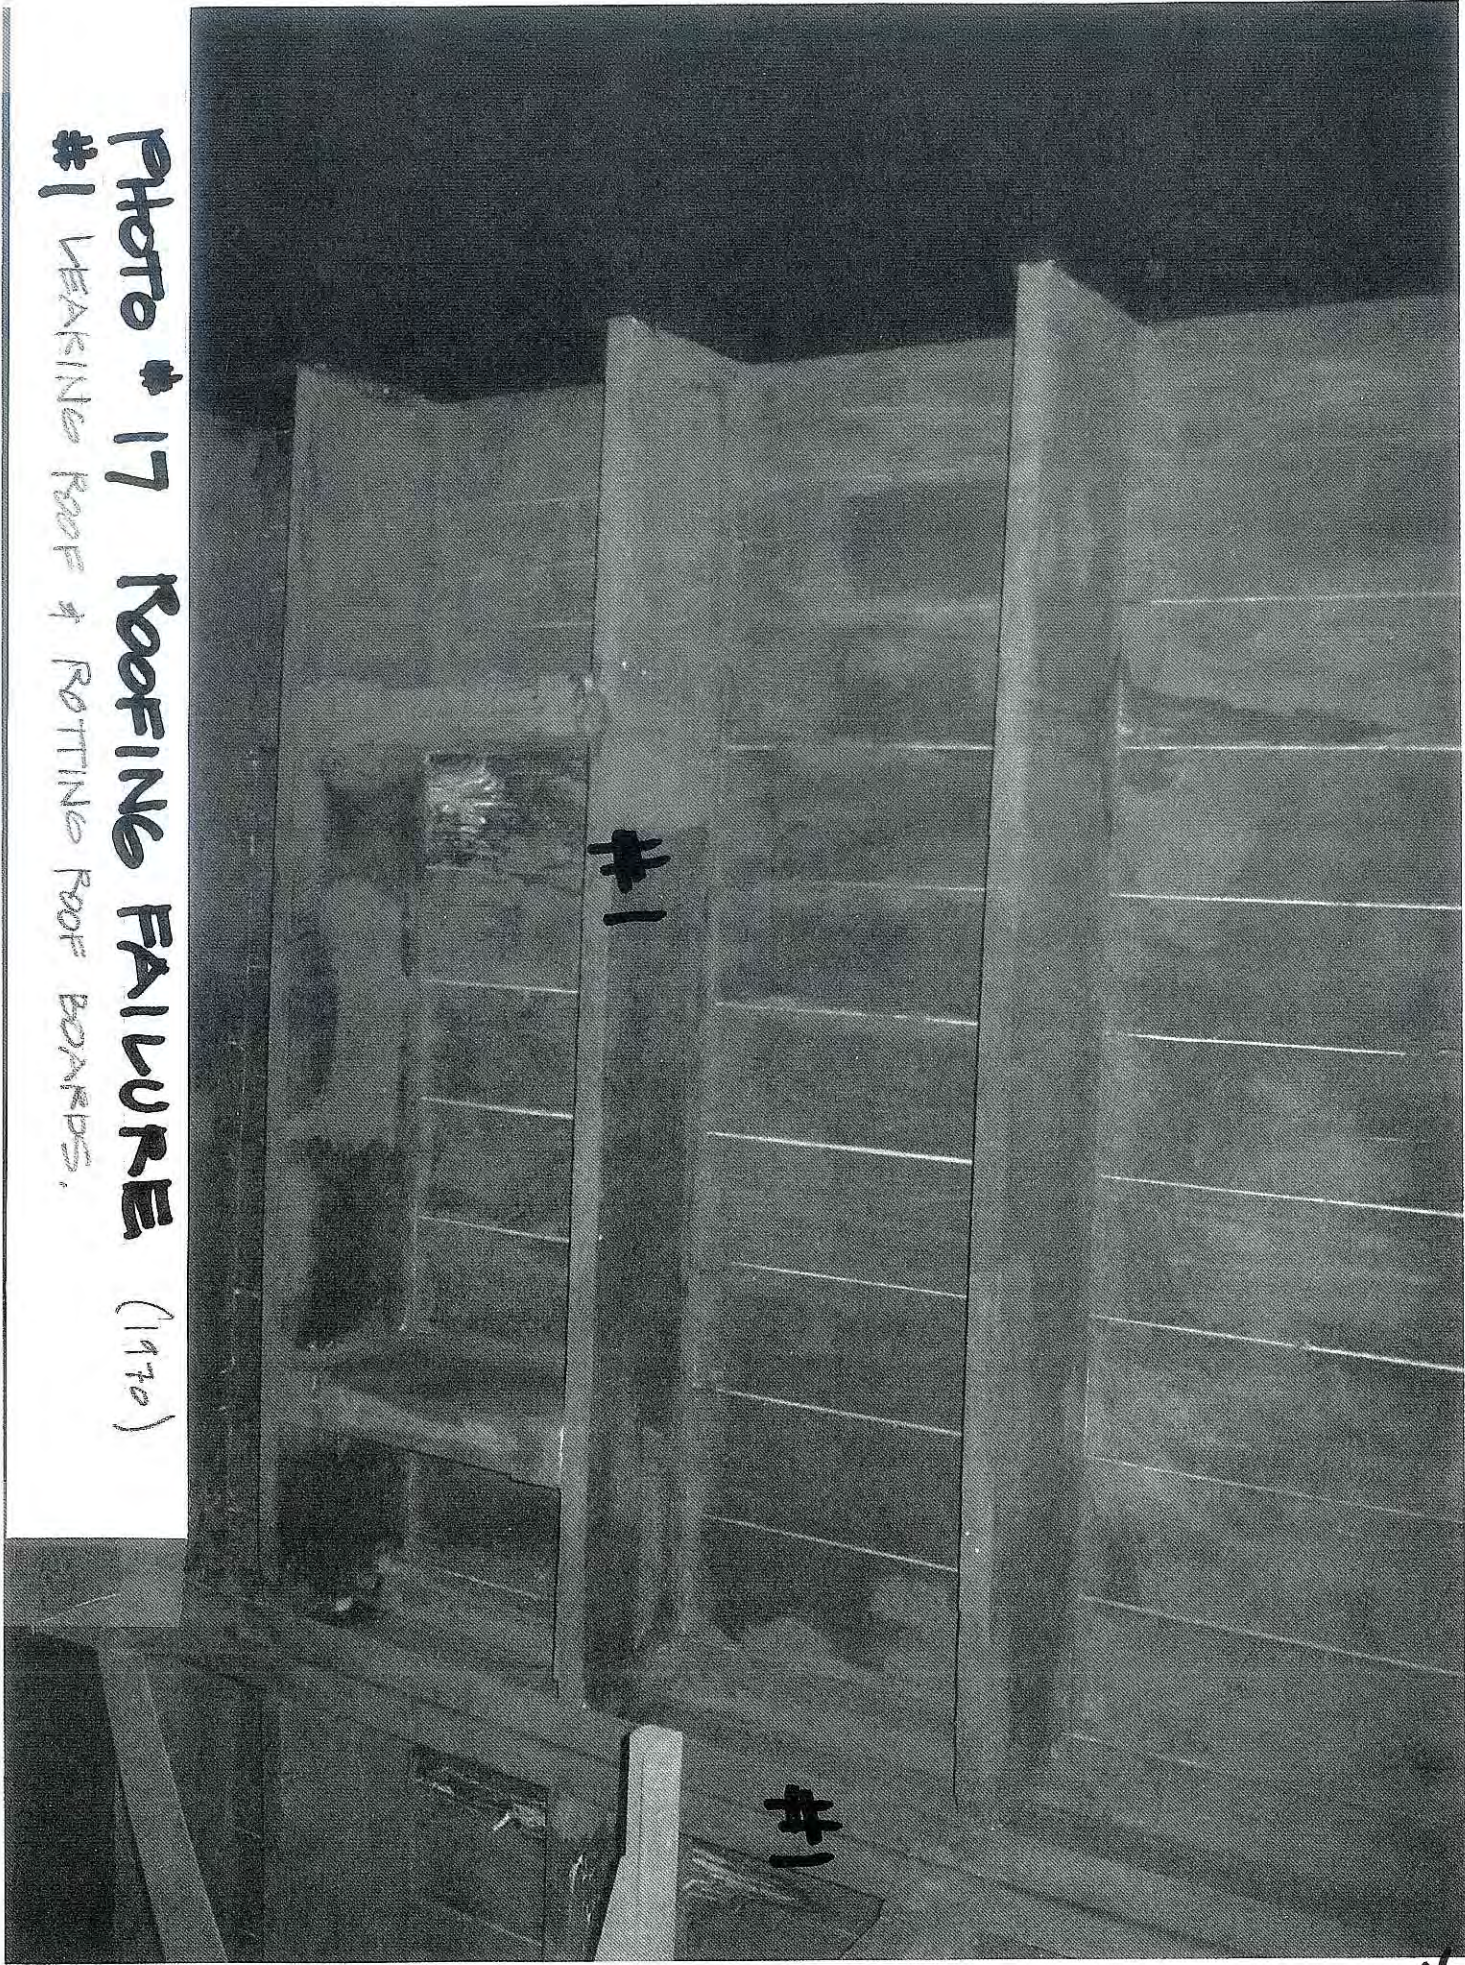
ROOFING FAILURE (1970)
